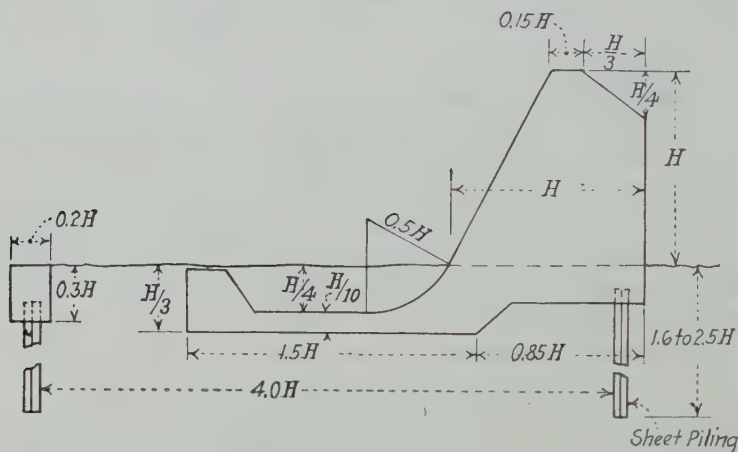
Section of masonry dam on sand foundation. (Koenig.)
